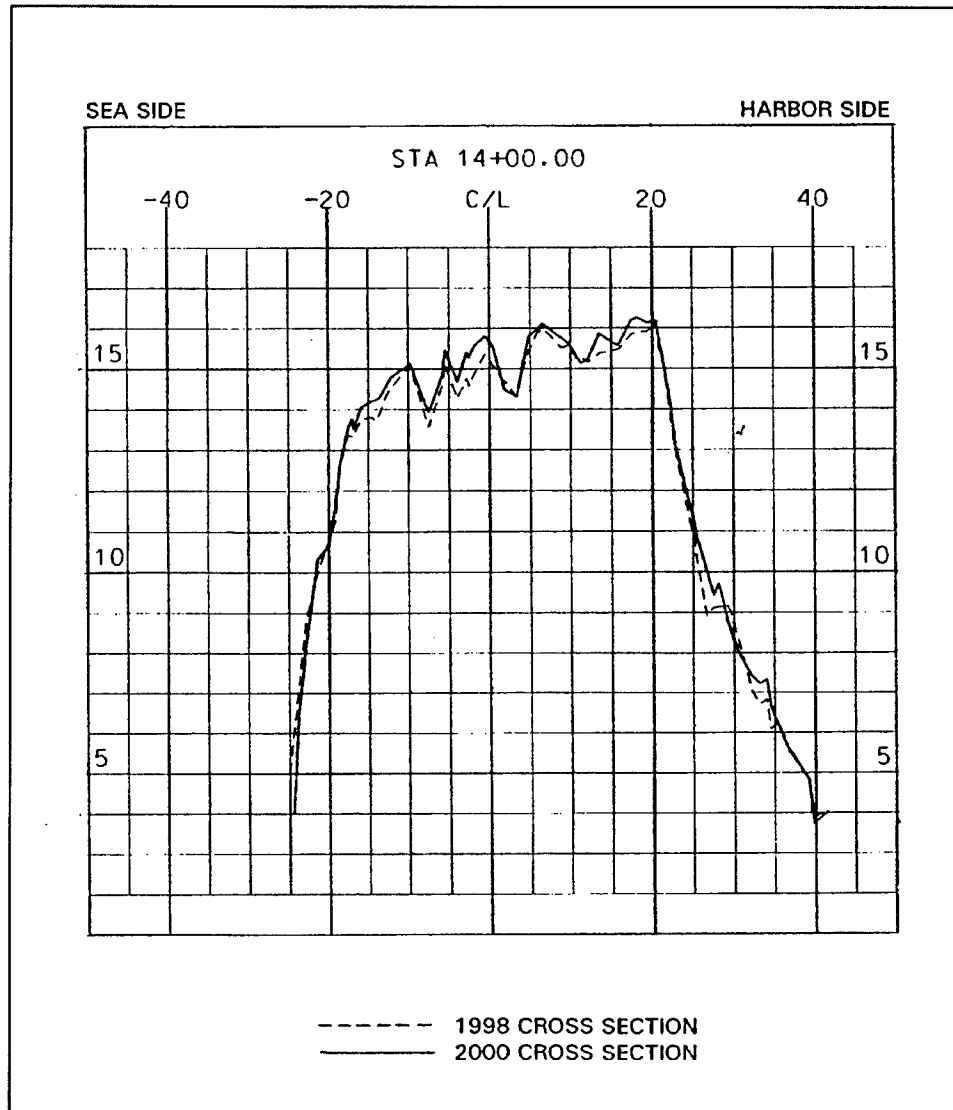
Cross sections of Morro Bay outer south breakwater, sta 14+00
